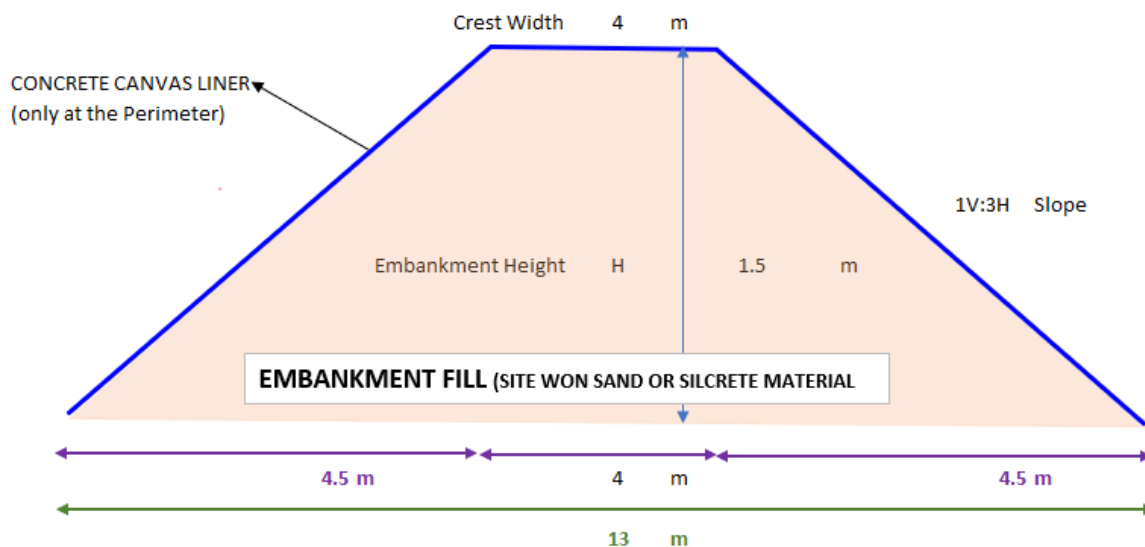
Liner Option 2 – Embankment covered with concrete canvas layer (not to scale)
